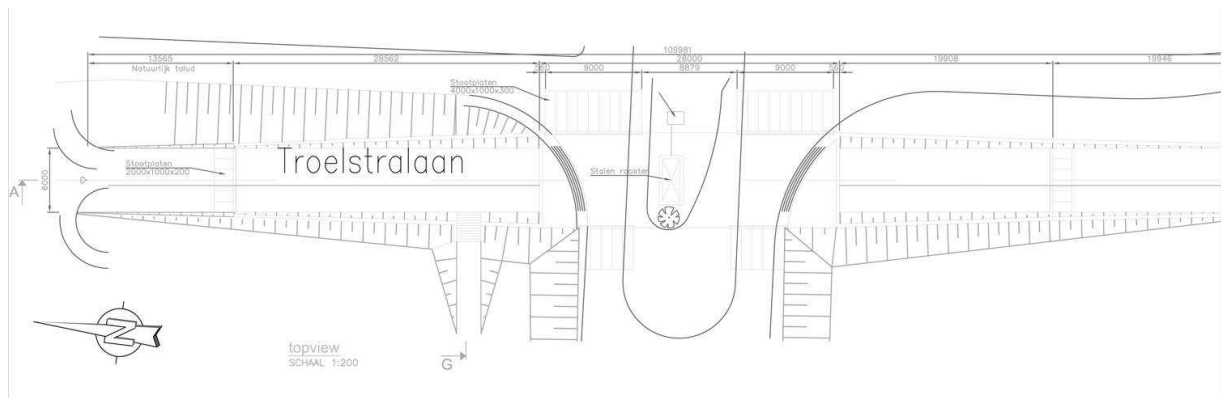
; overview of underpass at Ringbaan West and Troelstralaan.
